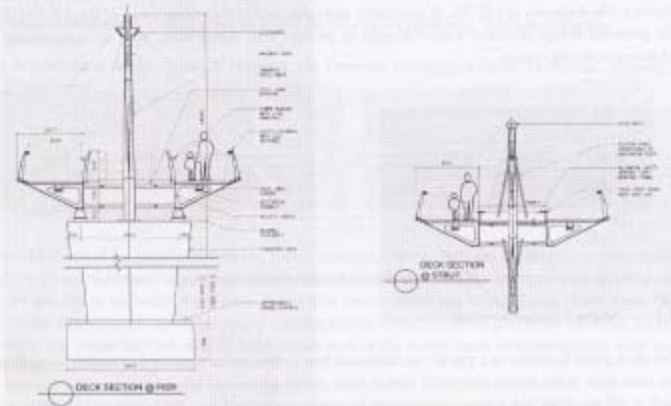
Henderson Crossing Pedestrian Bridge - section through deck and pter.
